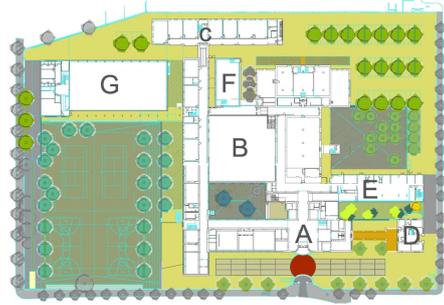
Architectural plan of the building, composed of small buildings, listed from A to G.
